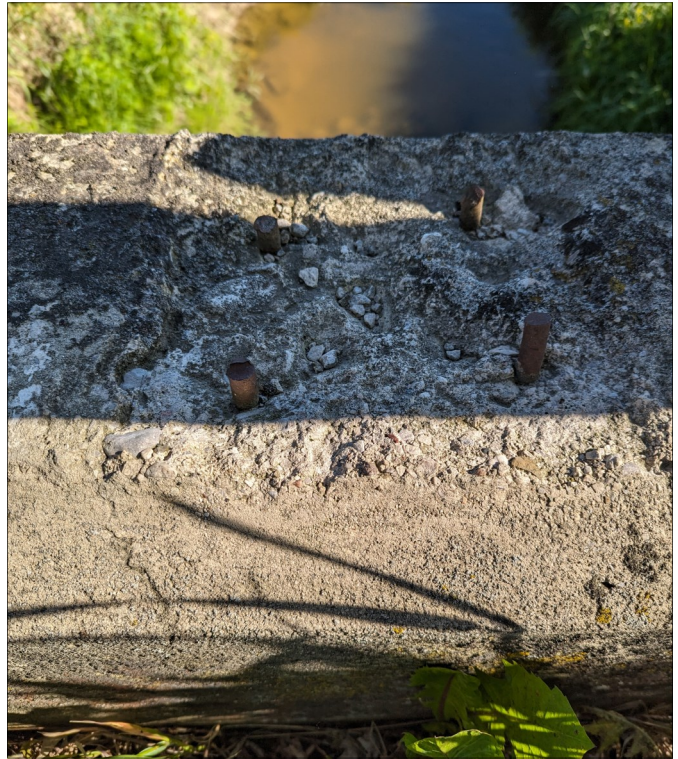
View of Spalling at Previous Post Locations (typ.).
